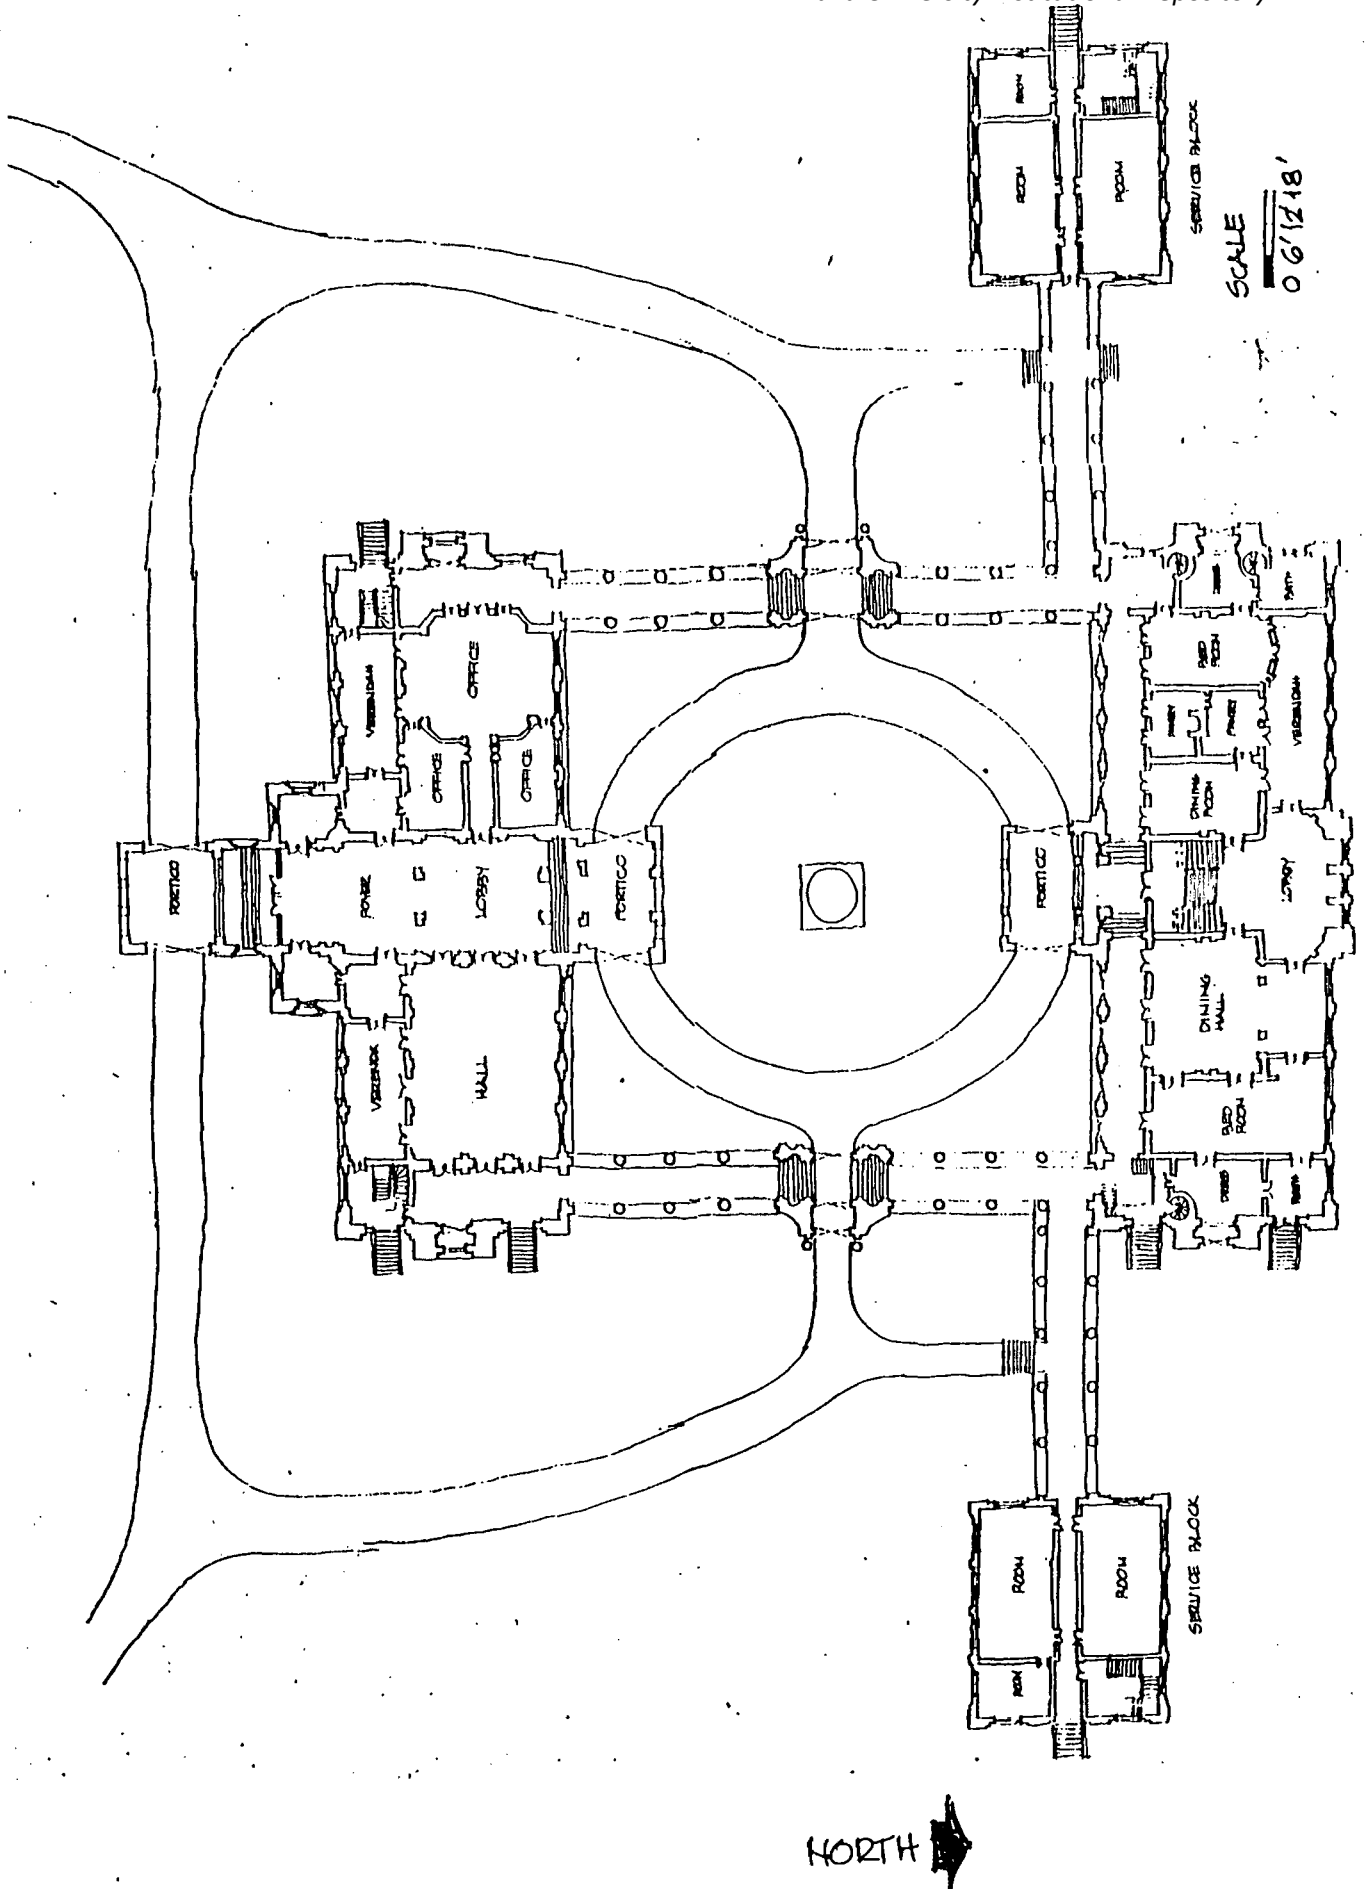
Ground floor plan, Governor's house, Dhaka
